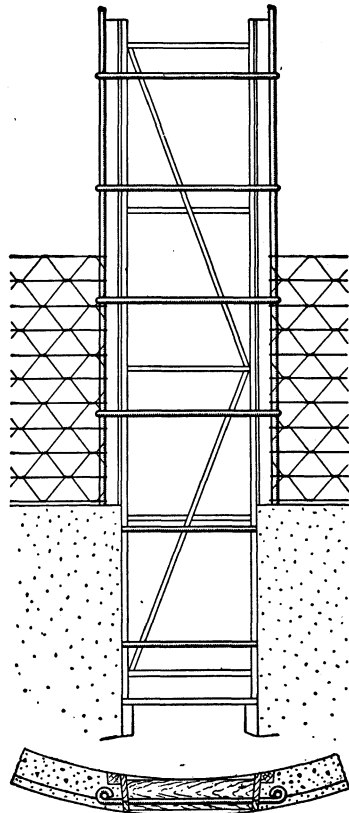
Details of forming and reinforcing a continuous doorway.
